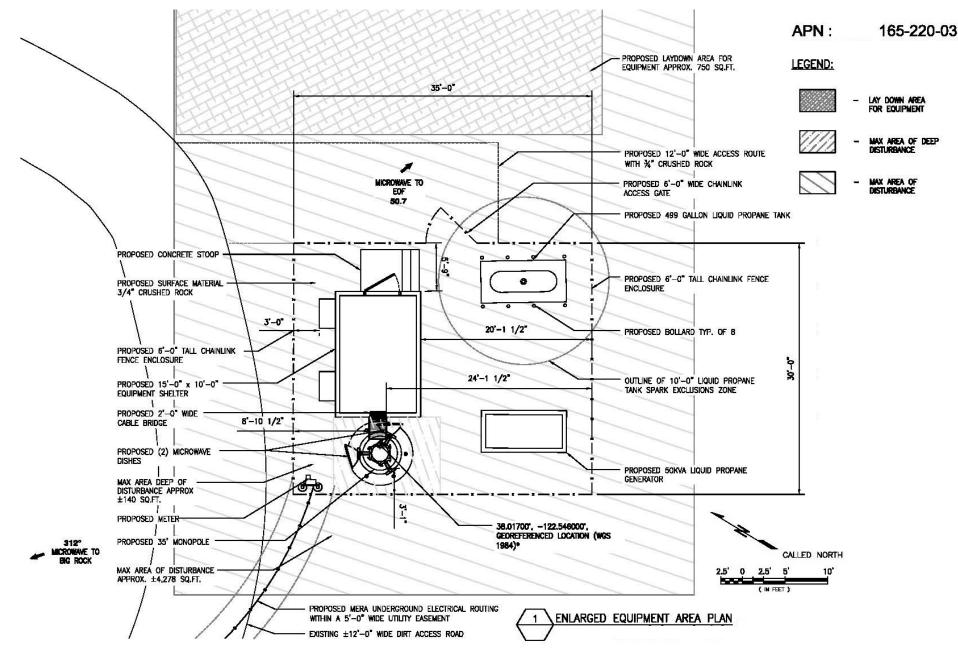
Site 22 - Skyview Terrace Water Tank Detailed Site Plan
